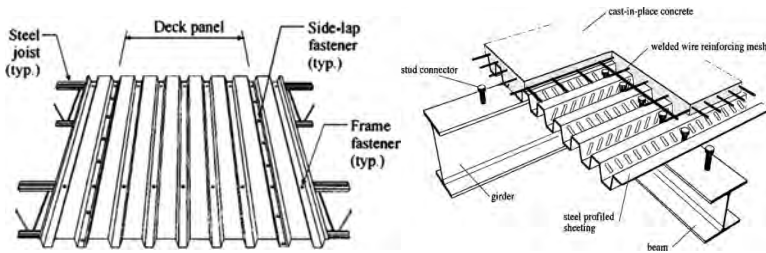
Steel Deck Diaphragms: (a) Bare Metal-Deck (Rogers & Tremblay, 2003a); (b) Composite Steel Deck (Hedao, et al., 2012).
